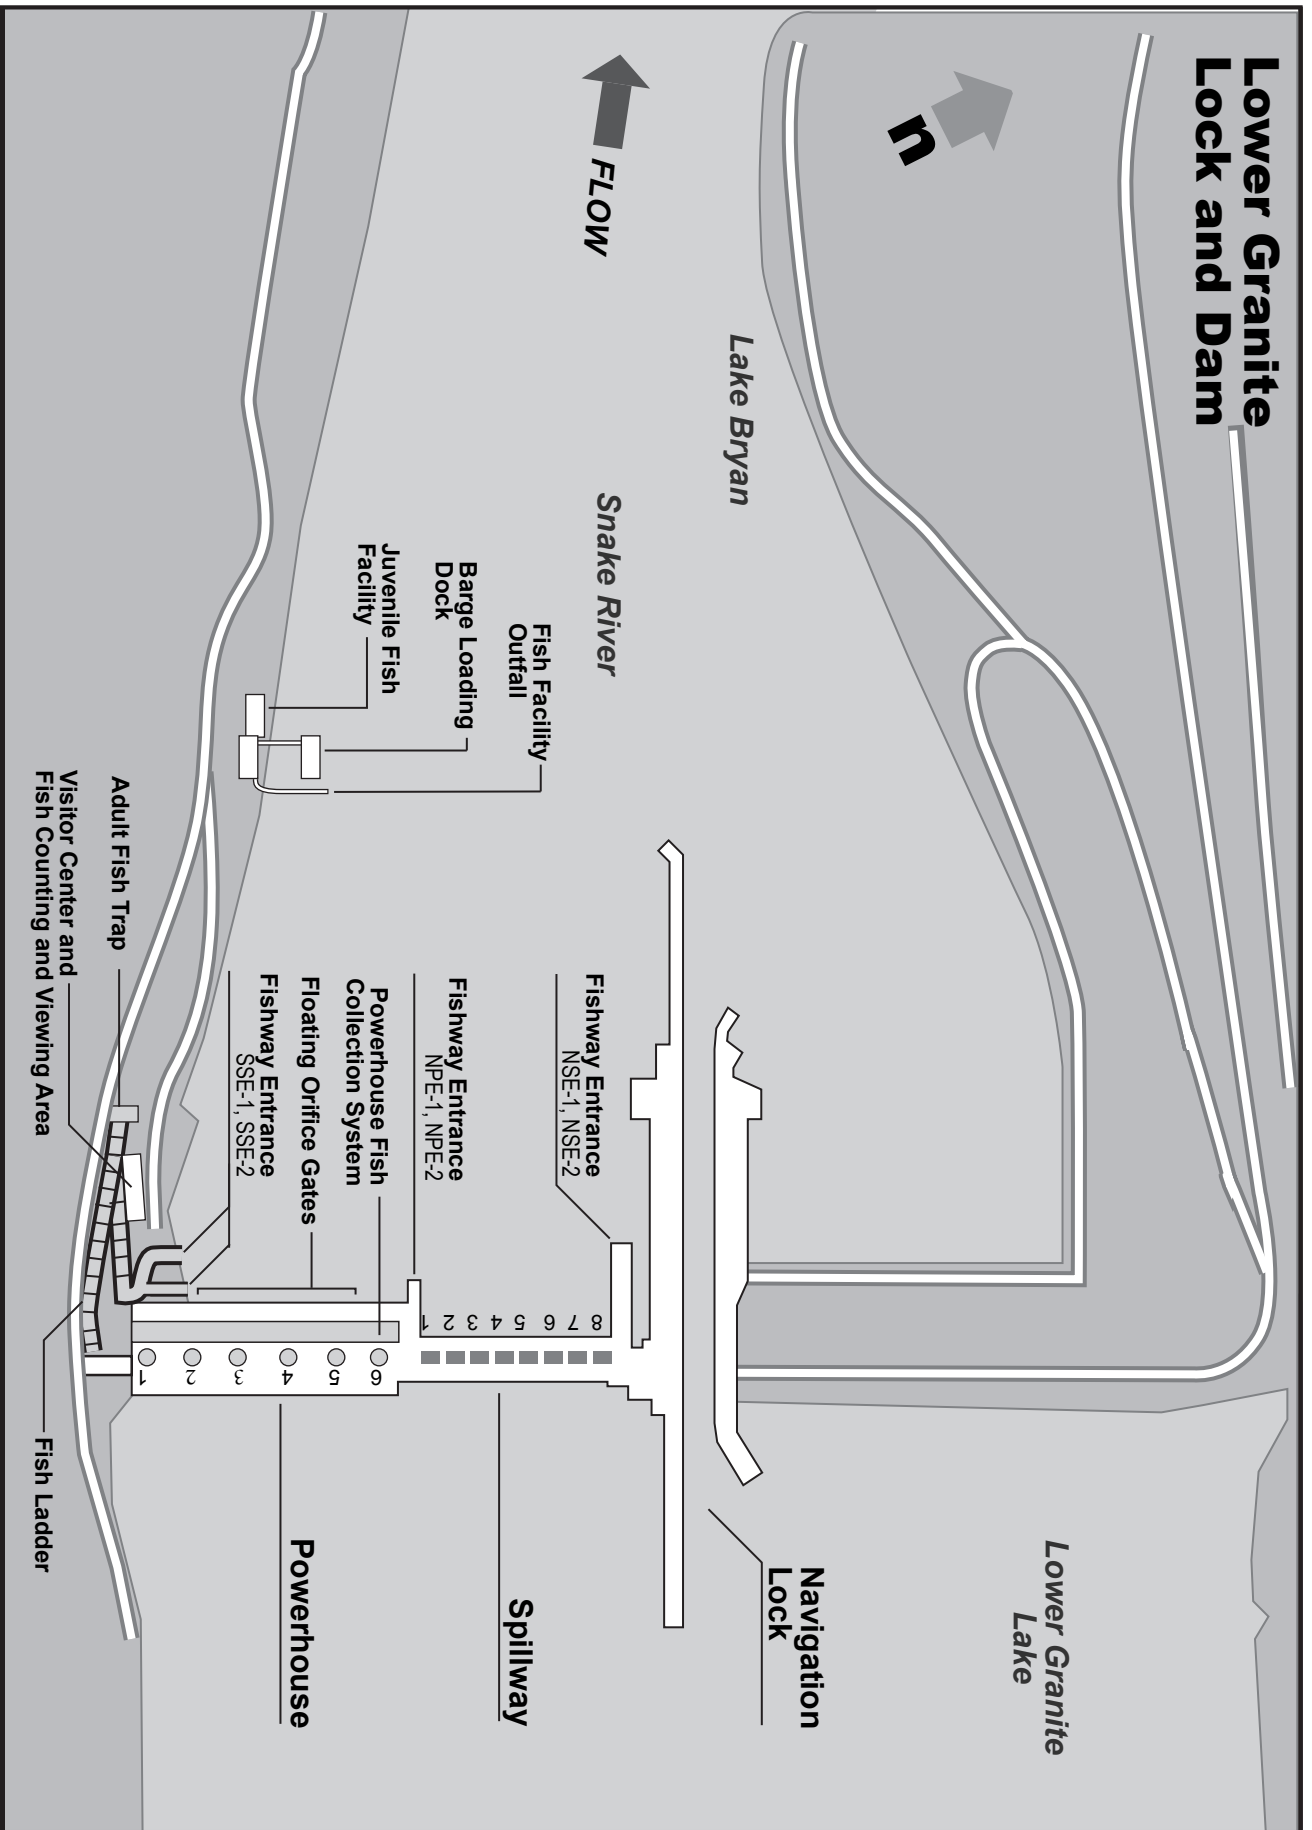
Lower Granite Lock and Dam General Site Plan
